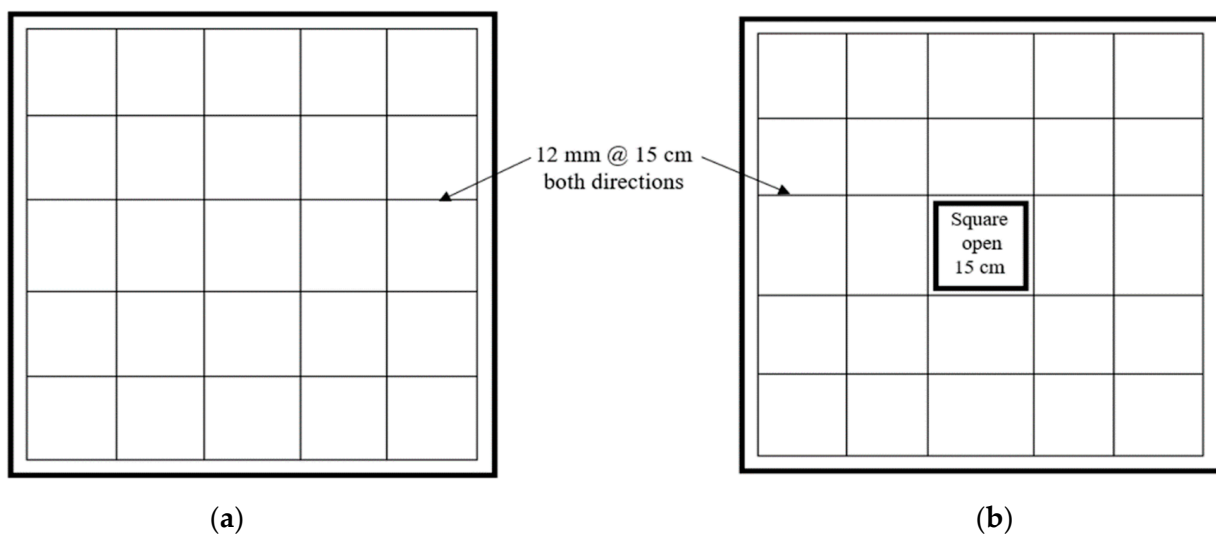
Reinforcement grid for (a): slab set S1, (b) Slab set S2.
